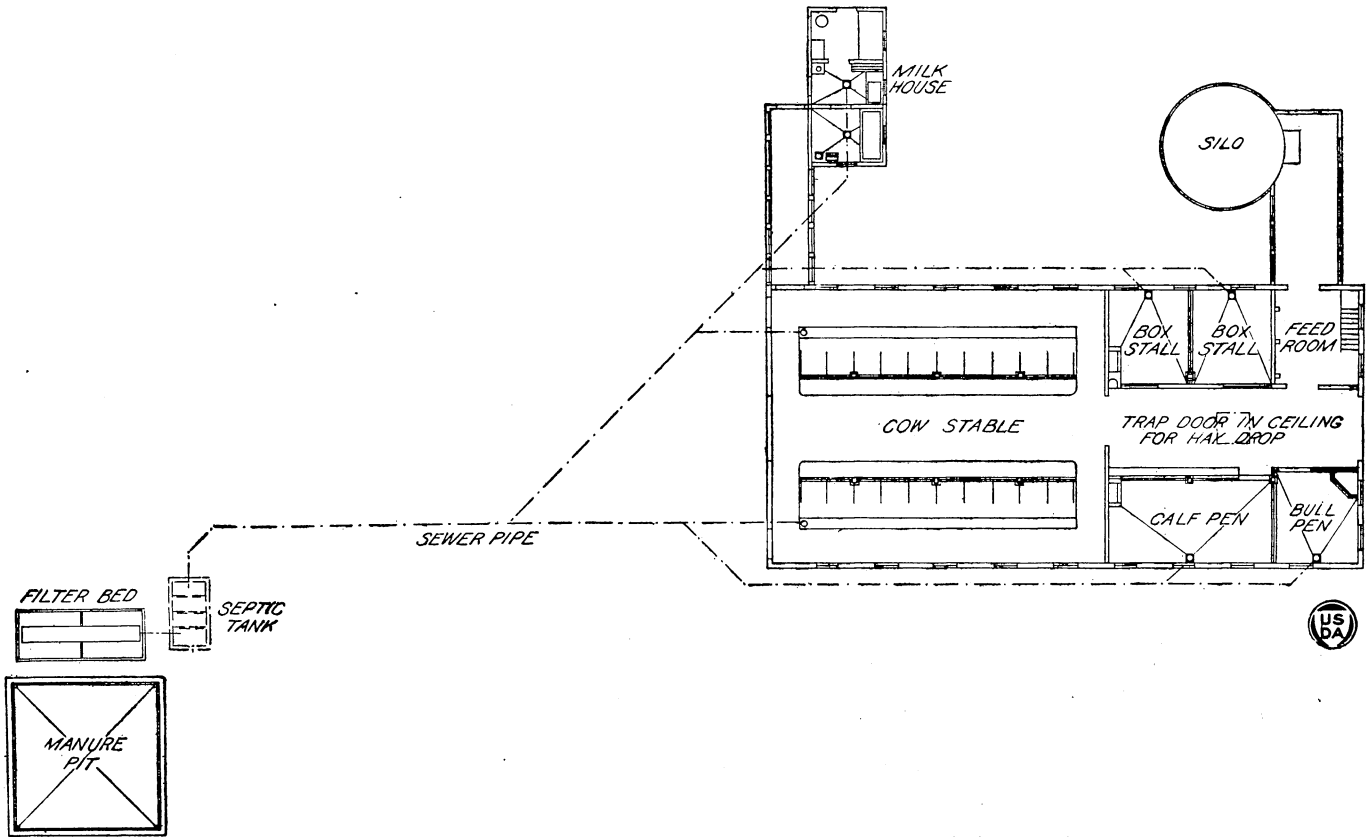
General arrangement of two-story barn, silo, milk house, and drainage system.
